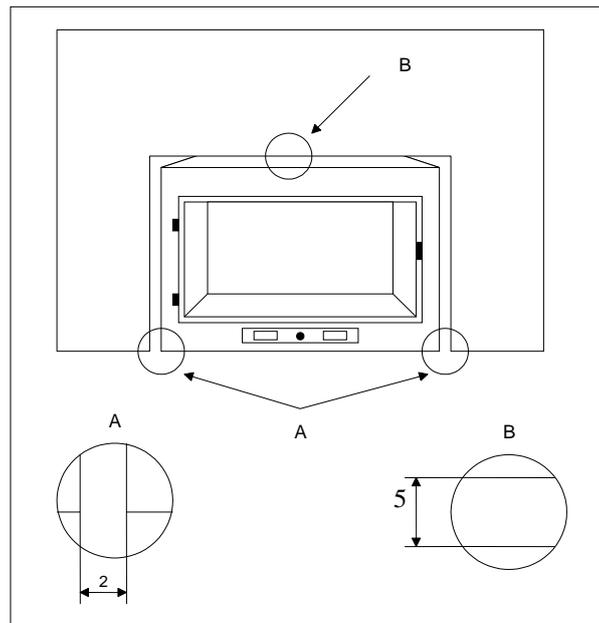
Expansion gaps between the fireplace insert and the enclosure (dimensions in mm).
